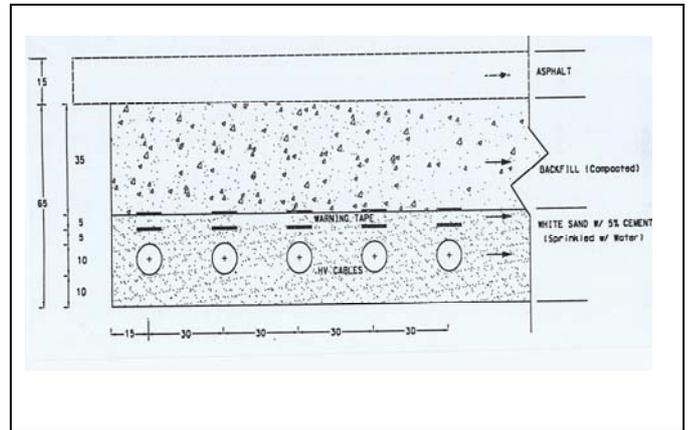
Details Measurements and Bedding Material for Trench with more than four cables:
